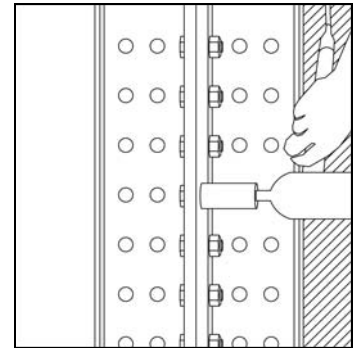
Here, the wrench operator is just starting final tightening of Bolt No. 2 to the required half-turn beyond "snug" condition (see Nut Rotation Council Specifications). In final tightening, a hand wrench is used to hold the end not being torqued to ensure that the true required turn measurement is not lost.
